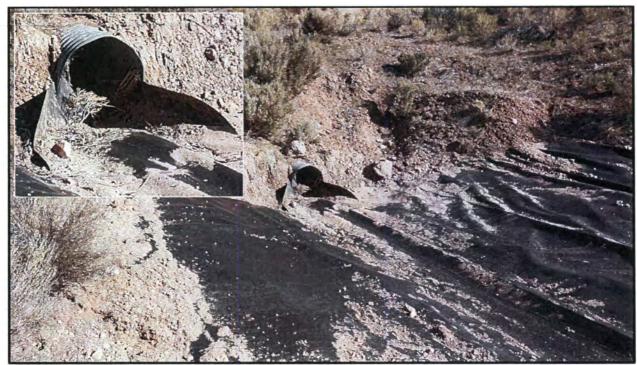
Looking north at the culvert inlet for the access road crossing of the left downstream groin. Note the sediment and brush beginning to accumulate at the inlet.
